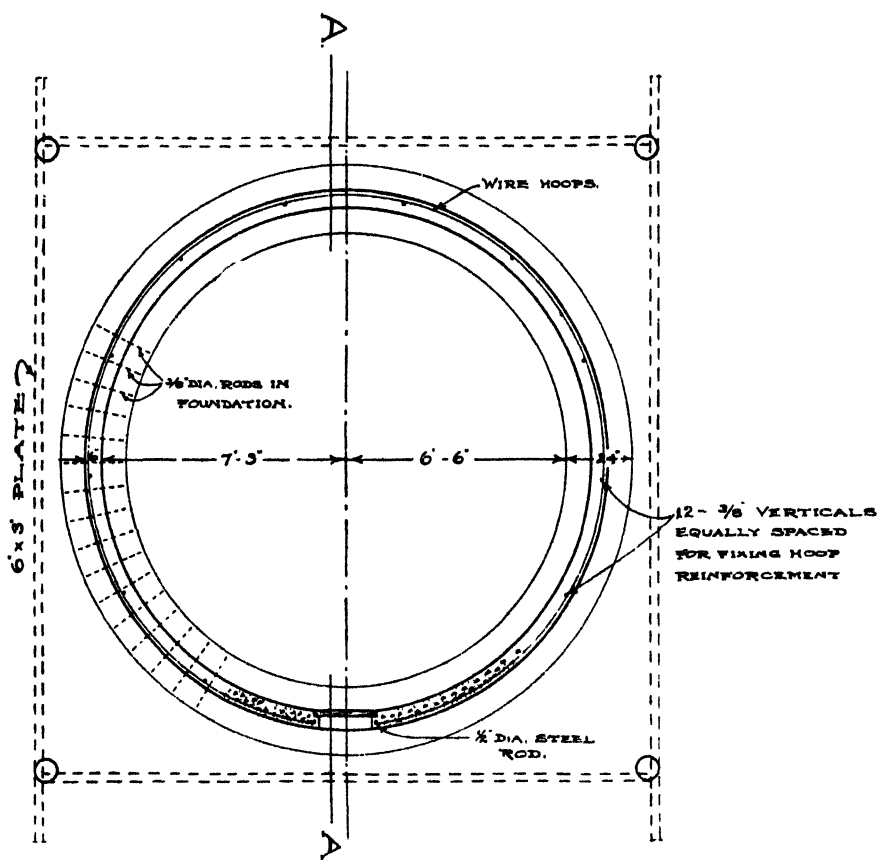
Plan of Circular Solid-wall Concrete Silo.
